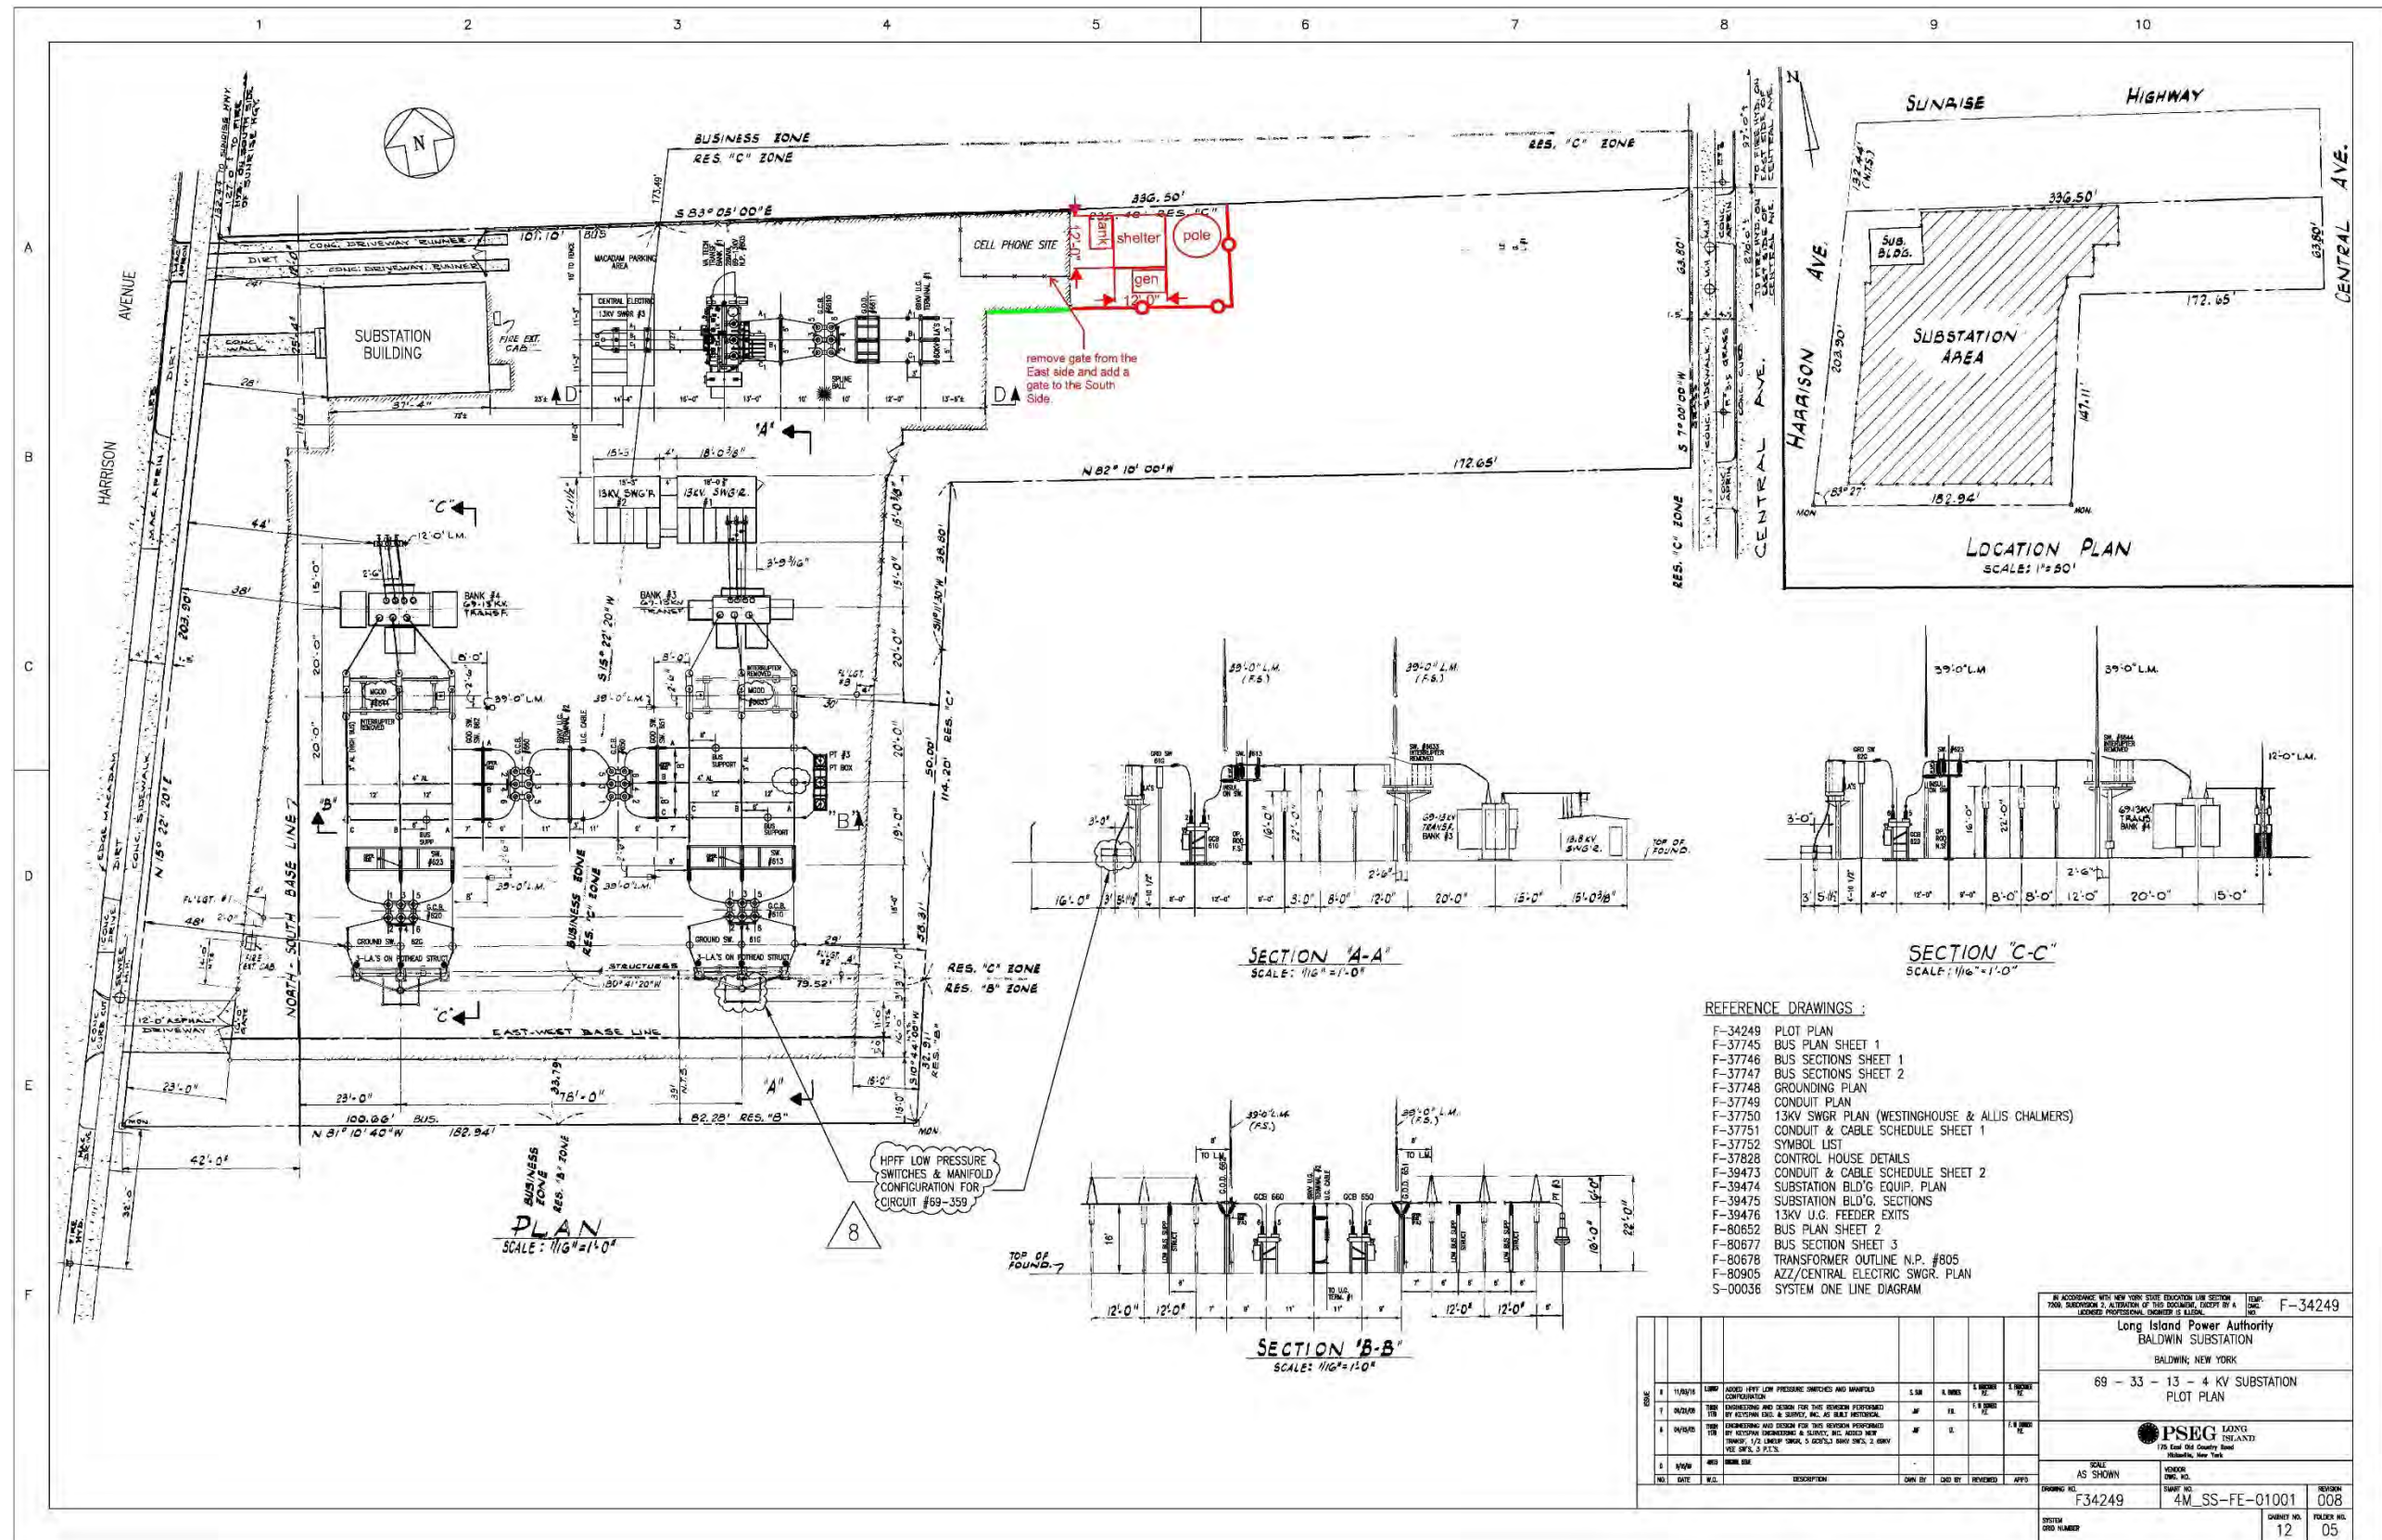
Current Baldwin Project Area Site Plan Depicting Proposed Tower Facilities.
